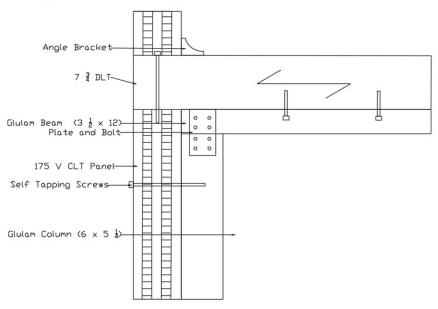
A 1"=27.5" Typical Corner CLT-CLT Connection
